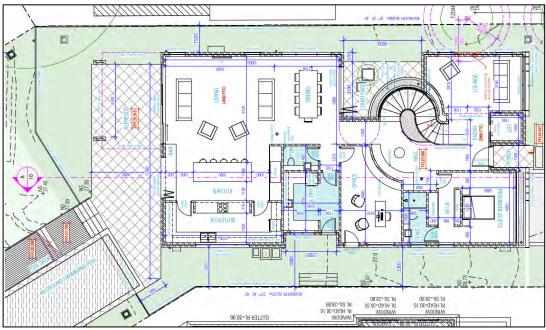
Proposed Ground Floor Level (unchanged from refusal)
